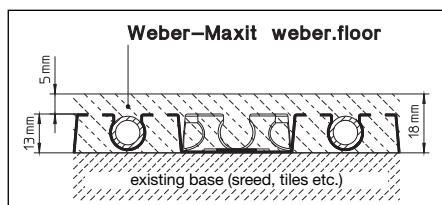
Weber-Maxit weber.floor (minimum covering 5 mm, total structural height 18 mm)
